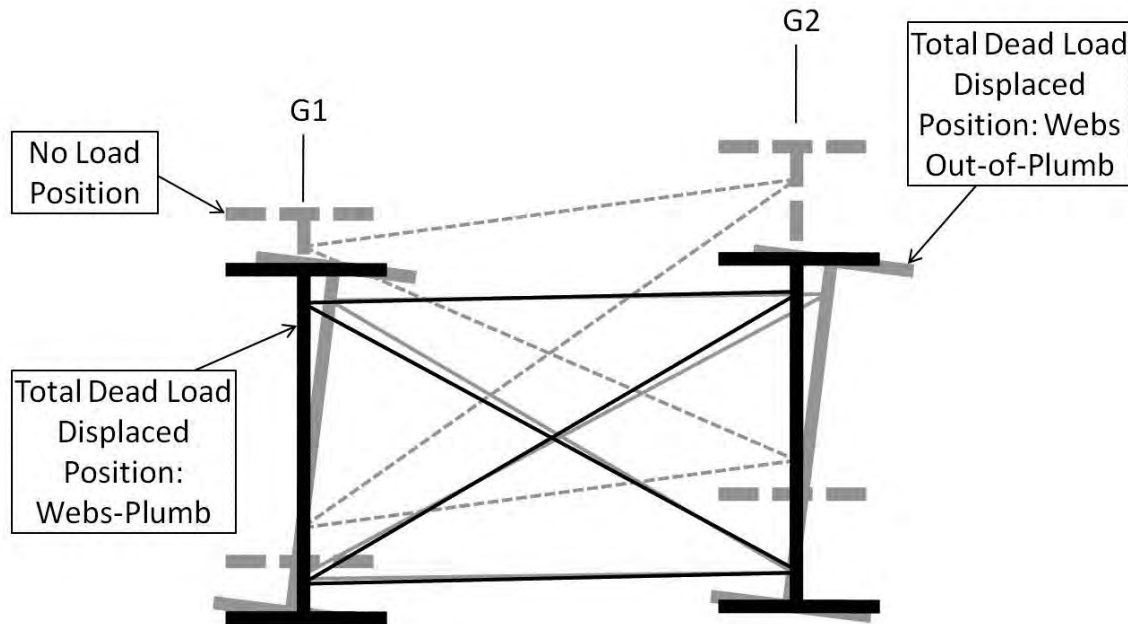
Intent of SDLF and TDLF detailing is to have the girder web-plumb at steel dead load or total dead load, respectively.
